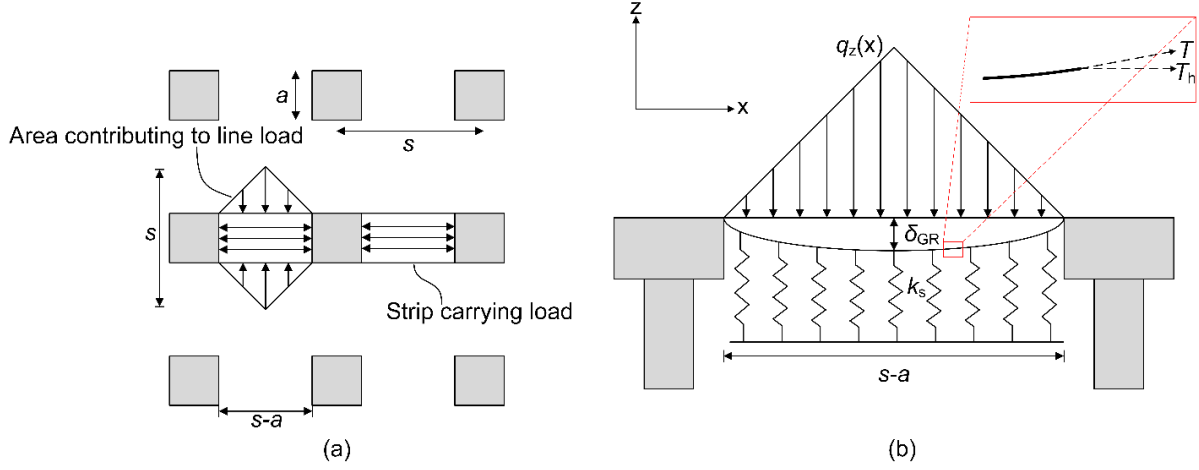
Zaeske (2001) (a) assumed load transfer to strips of reinforcement; (b) deformed reinforcement between pile heads
